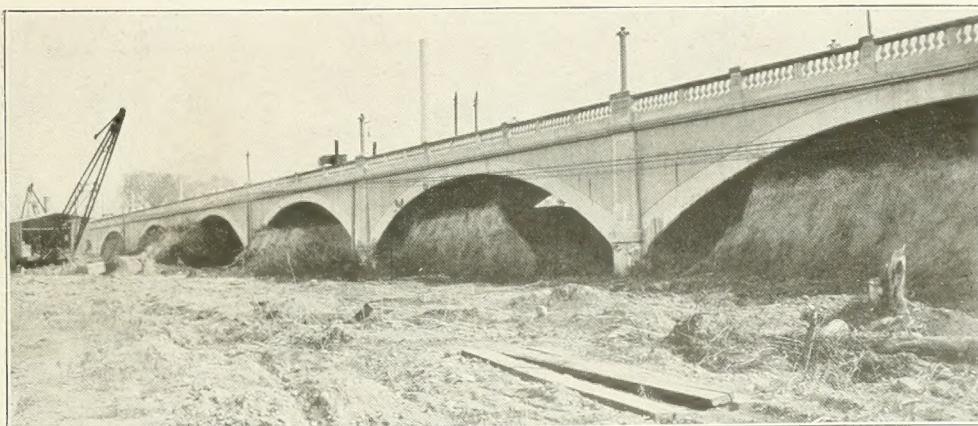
EXCAVATION AT THIRD STREET BRIDGE, MIDDLETOWN,
